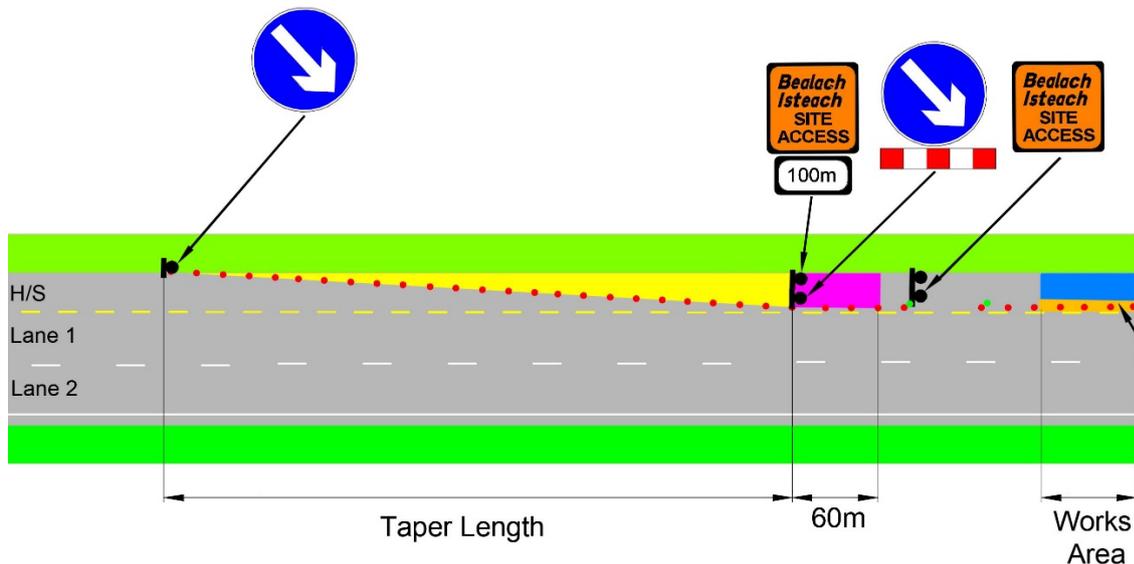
Dual Carriageway Hard Shoulder Taper
